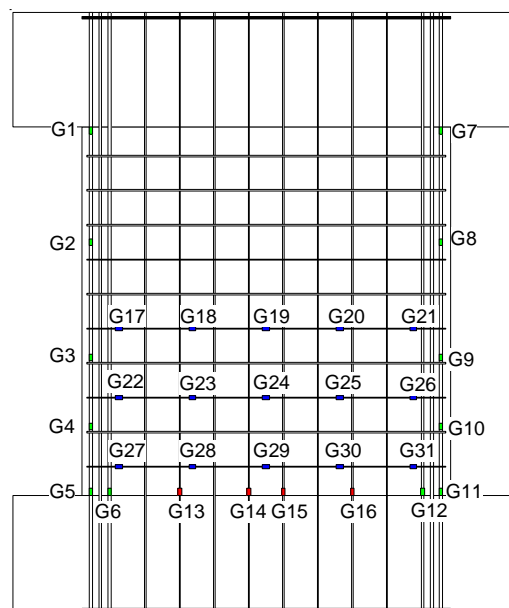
Strain gauges setup – Reinforcing steel bars
